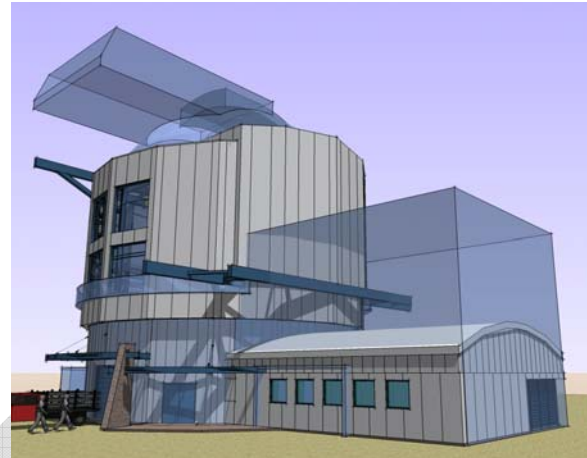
The existing enclosure's dome and support building are taller than the proposed facility.
